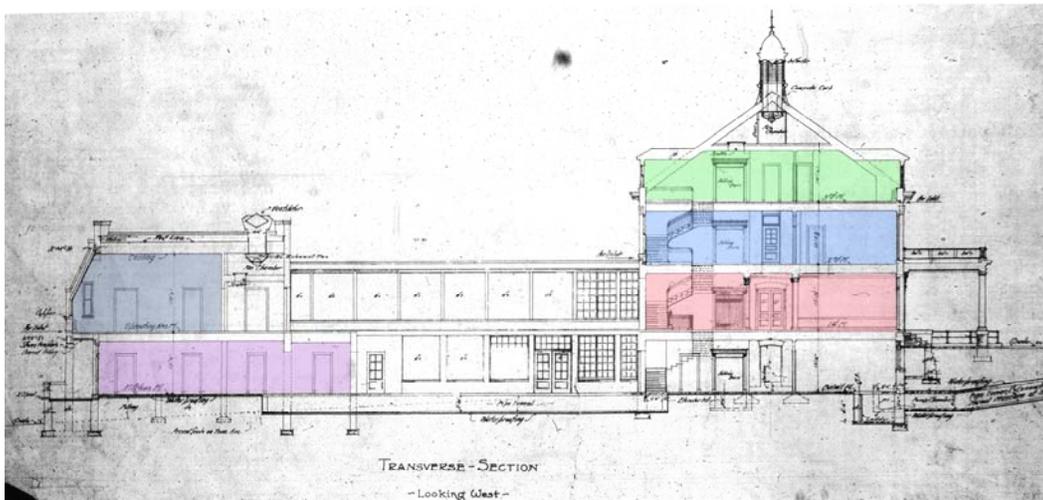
Transverse section, Naval Hospital Washington, Washington, DC, 1903 (NARA College Park, RG 71 521-31).
